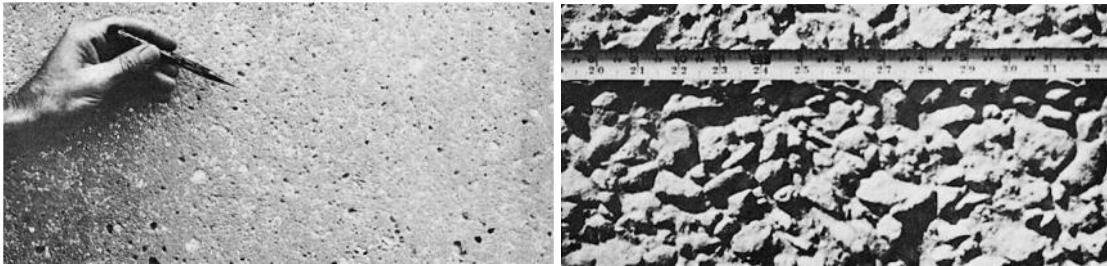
Light (left) and heavy (right) sandblasted concrete surface (extracted from [43])
